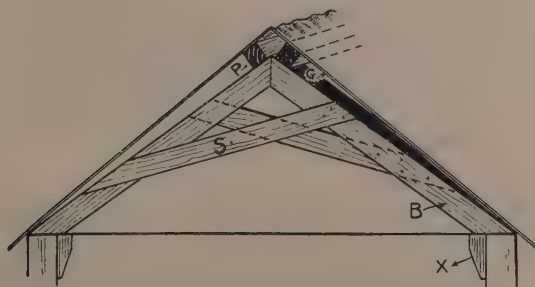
CENTRE TRUSSES WITH PURLINS (P) TO CARRY THE ROOF SHEETS.
